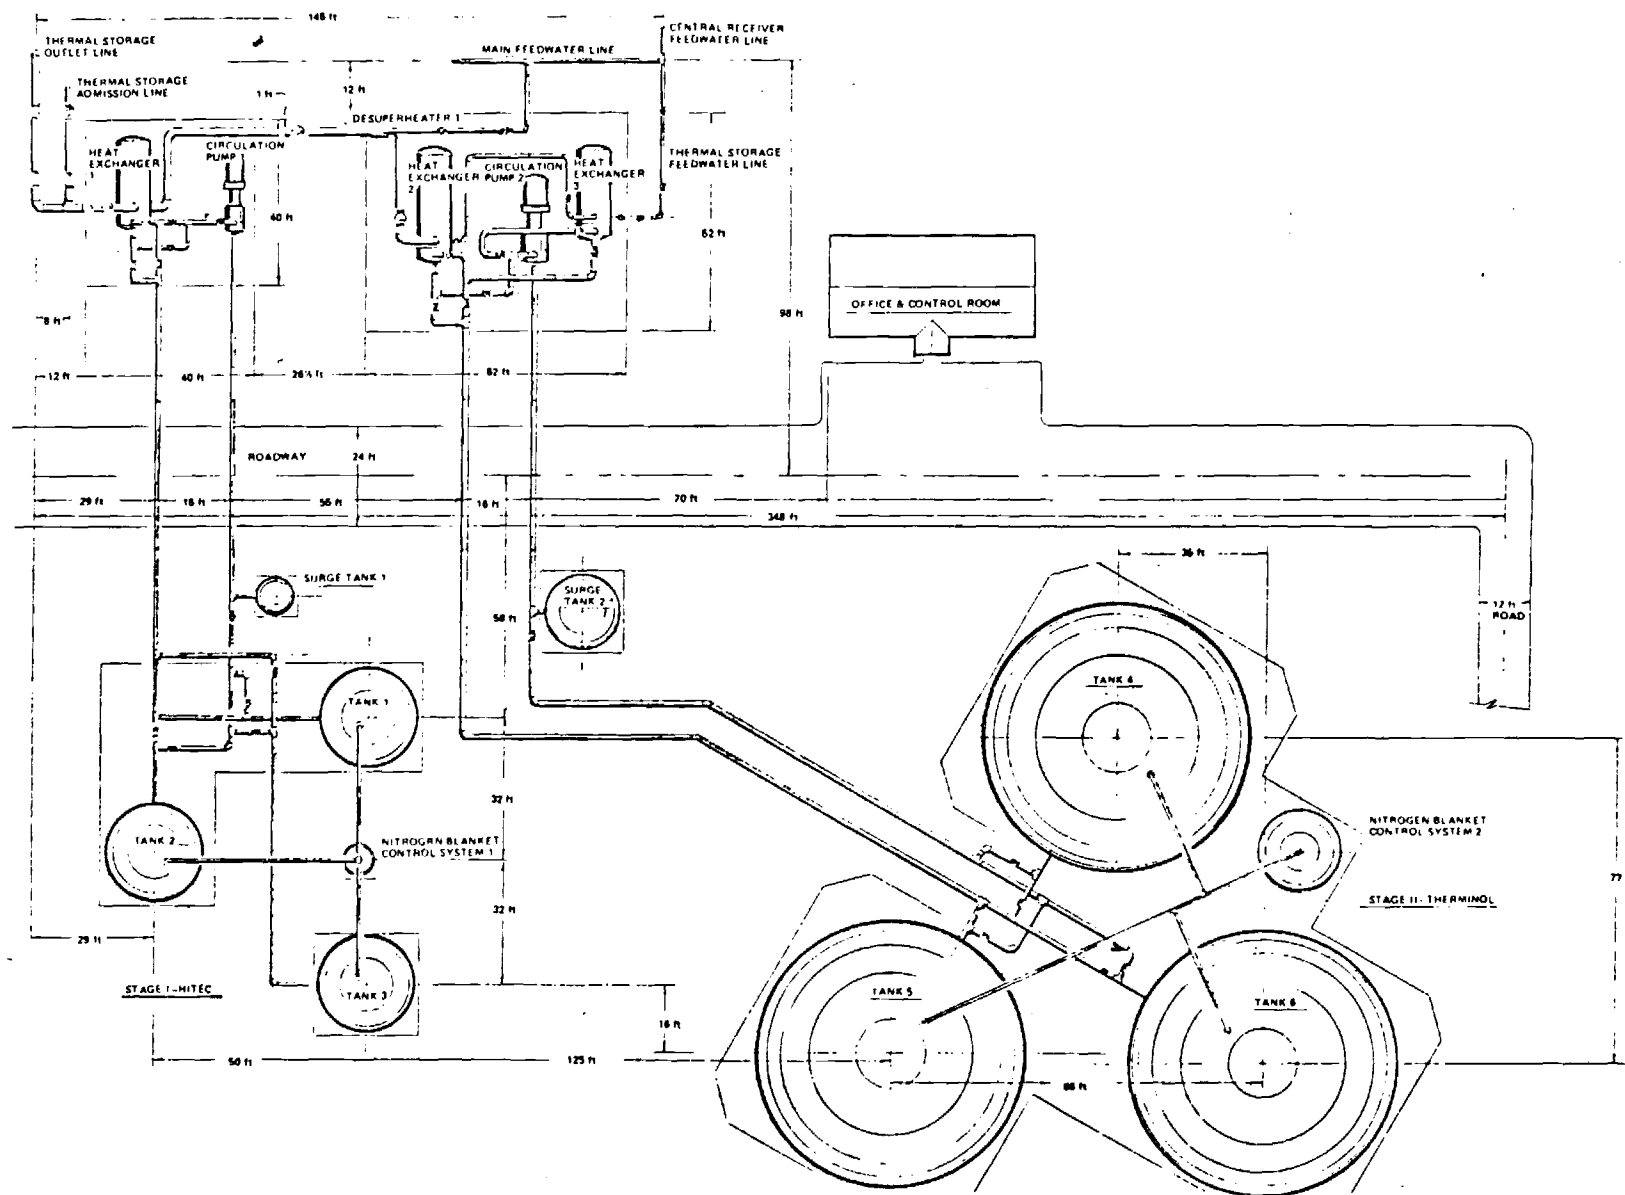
Preliminary Ground Layout for Two-Stage Pilot Plant Thermal Storage Subsystem.
